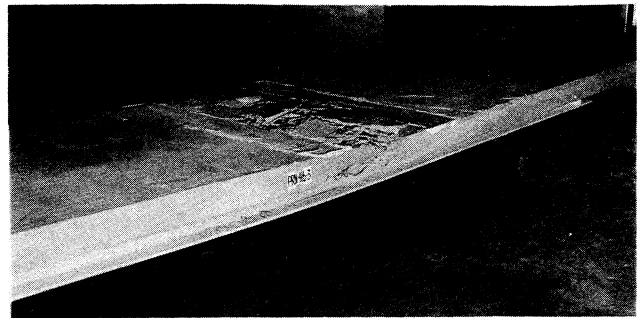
View of Beam 41b. Note the absence of herringbone type cracking in this beam. Collapse was due to flexural failure (crushing of concrete slab).
